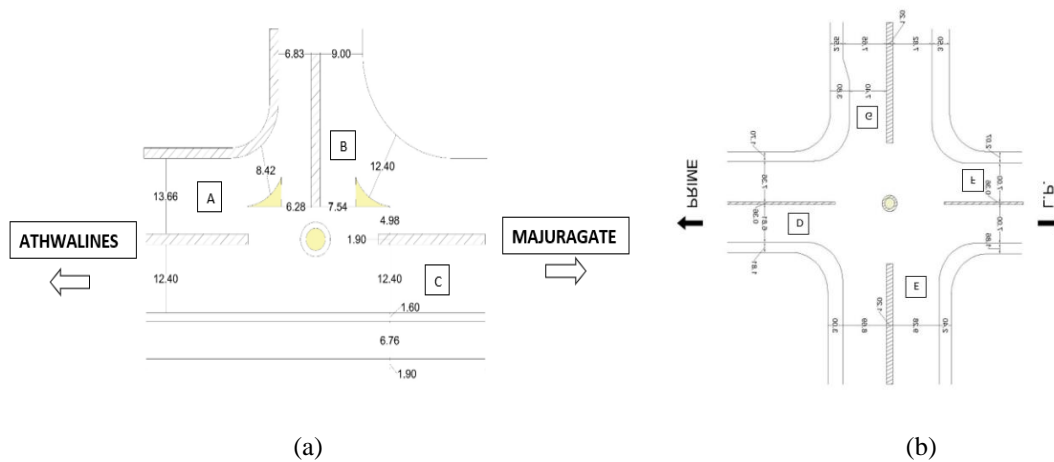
Plan showing (a) Layout of Mahavir Chowk Intersection (b) Layout of Surbhi Dairy Intersection
